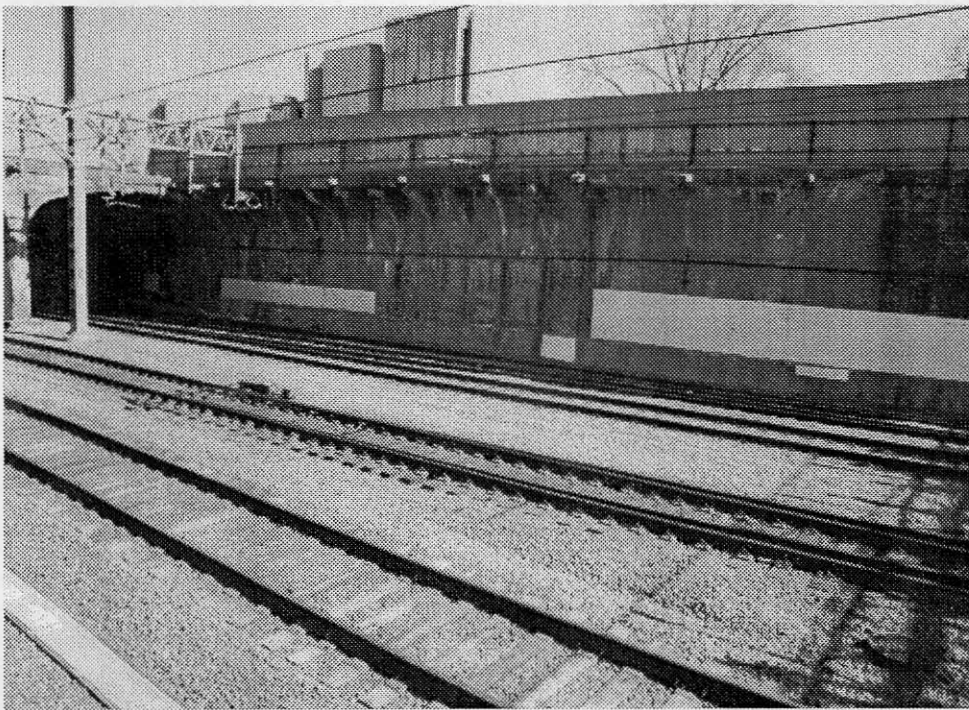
Reinforced concrete retaining wall along east side of New Haven Cut. Brackets along upper portion of cut carry Artizan Street over railroad right-of-way.
